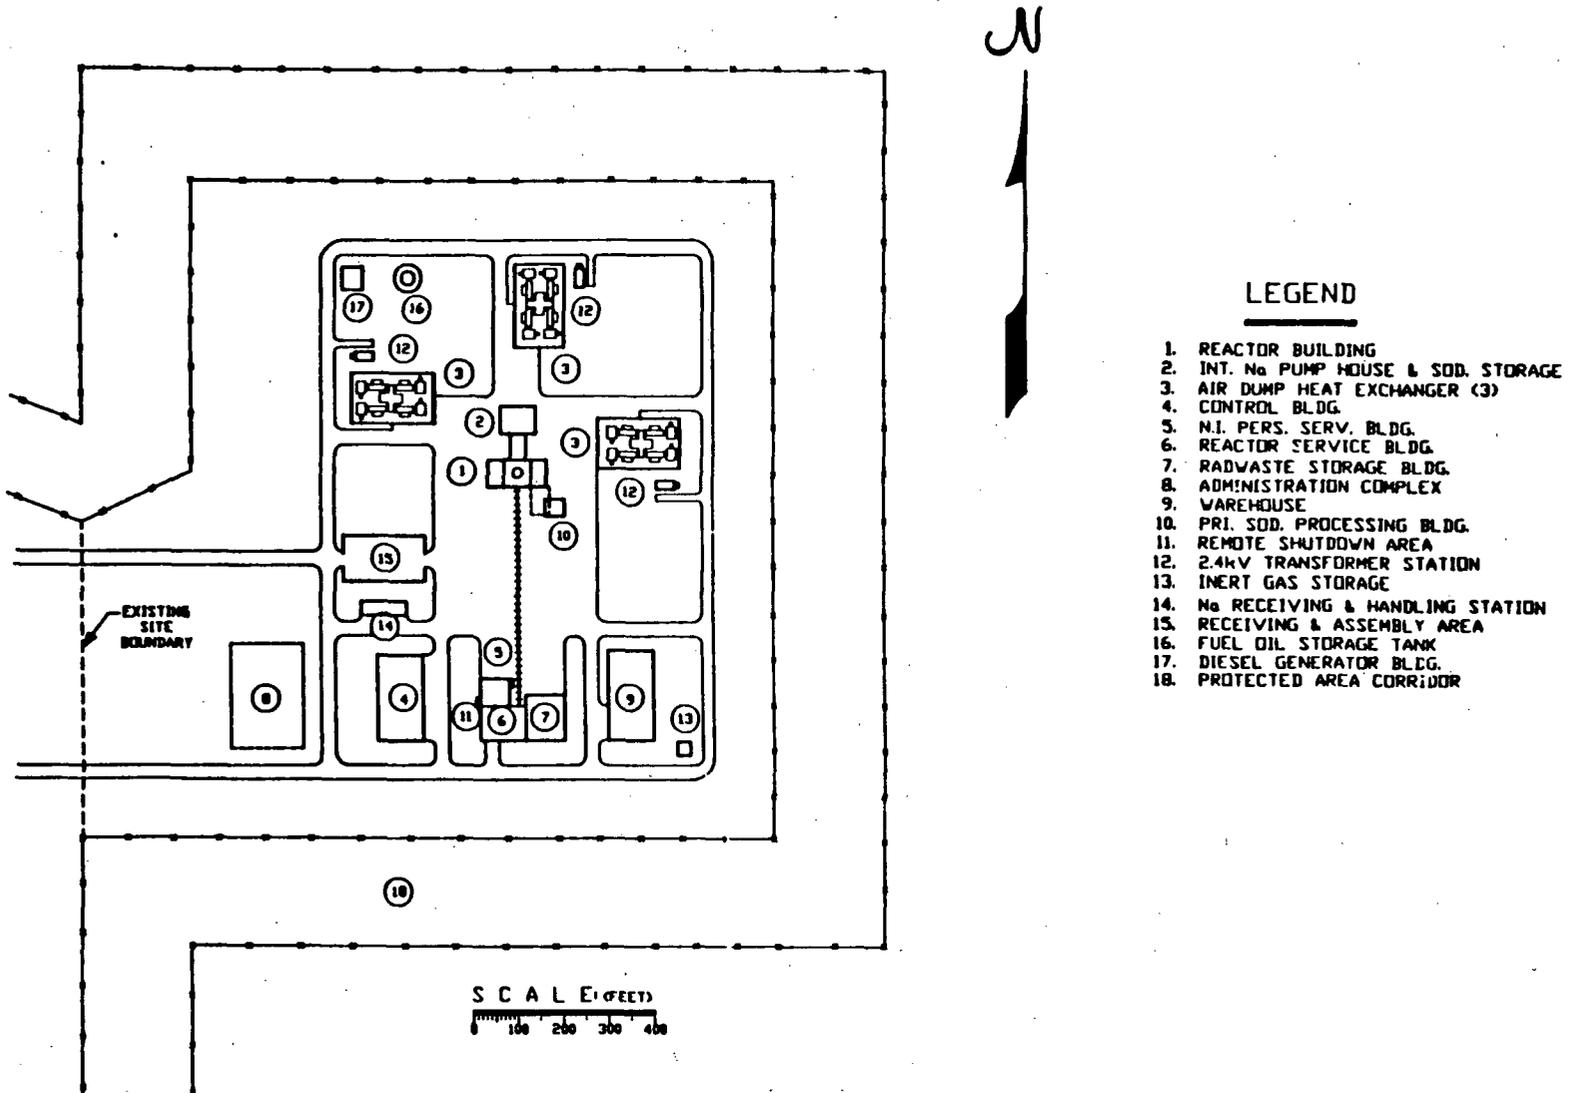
PRISM TEST FACILITY WITH DUMP HEAT EXCHANGER SYSTEM
